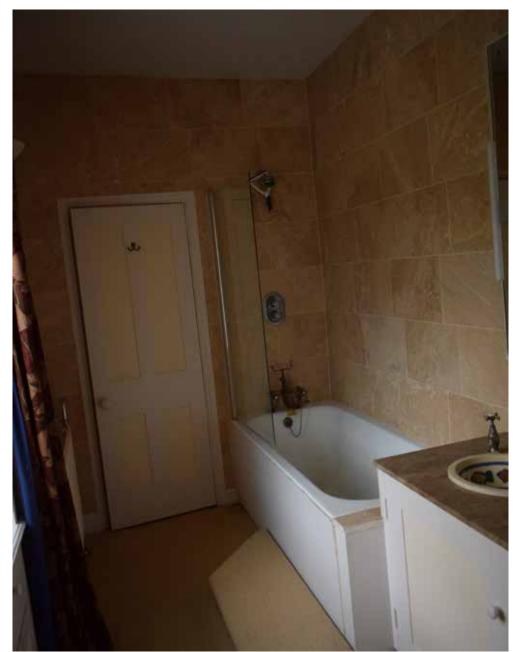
View of the ensuite to the Master bedroom. Non-structural wall to toilet to be removed.
